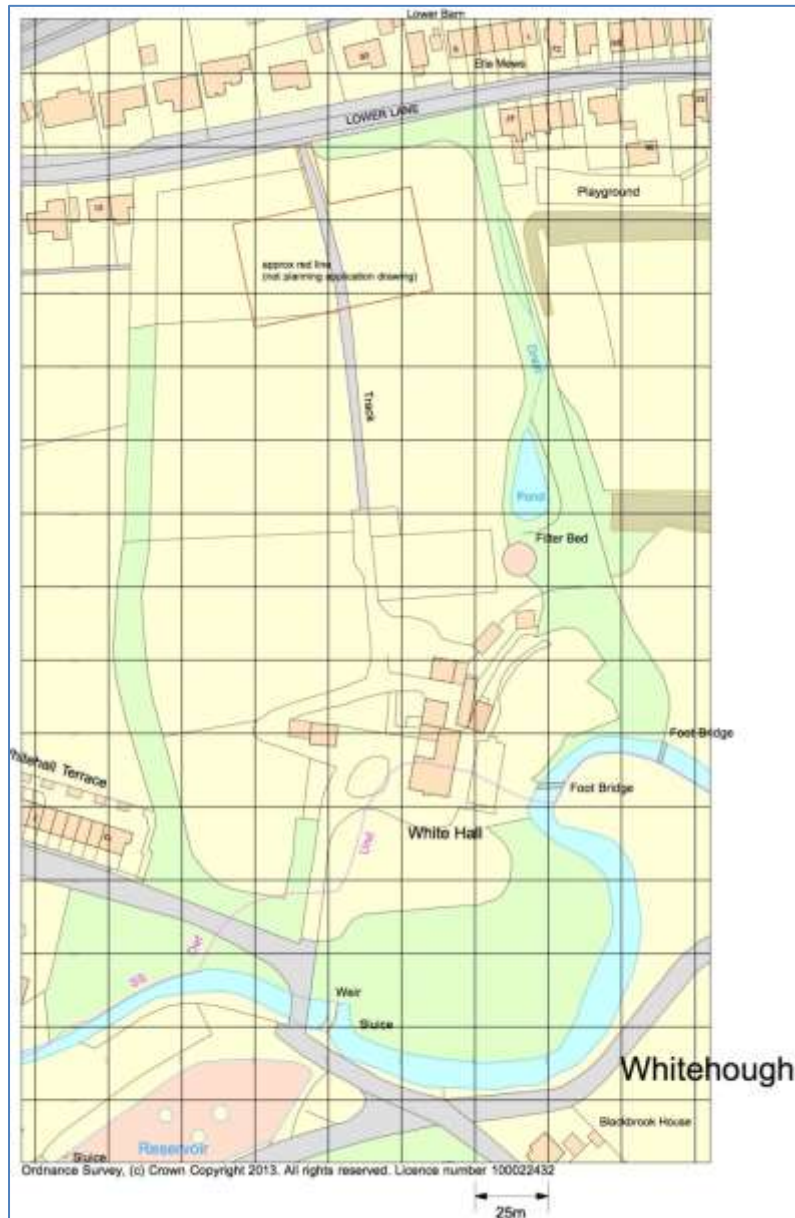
Site location plan from 1:1250 Ordnance Survey; reproduced not to scale
